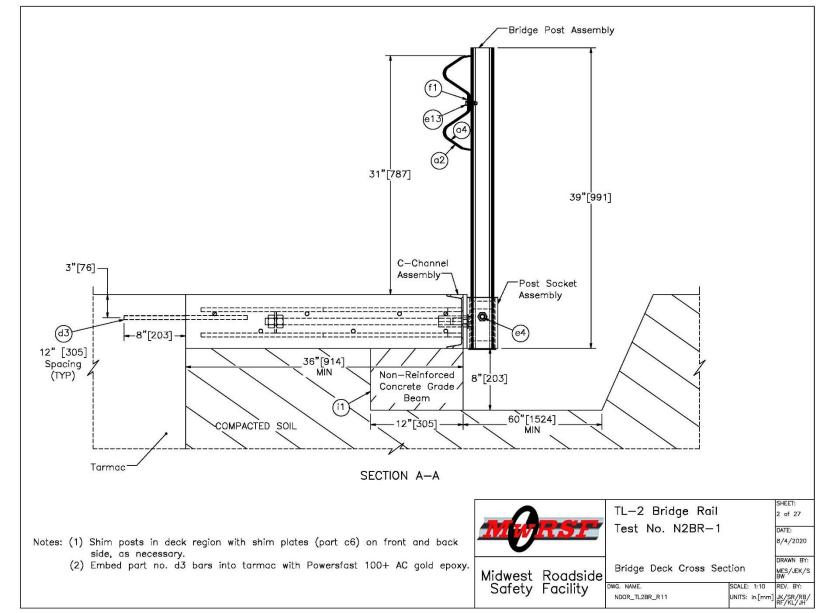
Bridge Deck Cross Section, Test No. N2BR-1
